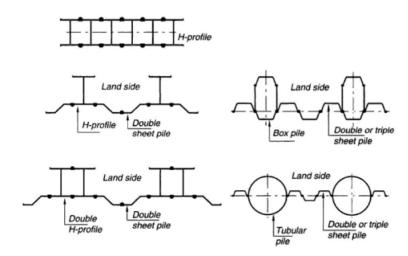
horizontal cross sections of various sheet pile quay walls (de Gijt and Broeken 2014)
